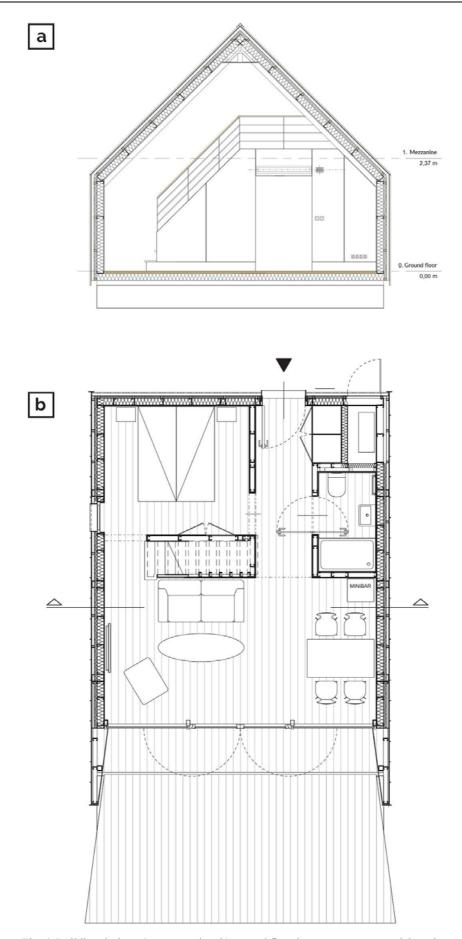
Building design: a) cross-section, b) ground floor layout; source: own elaboration
